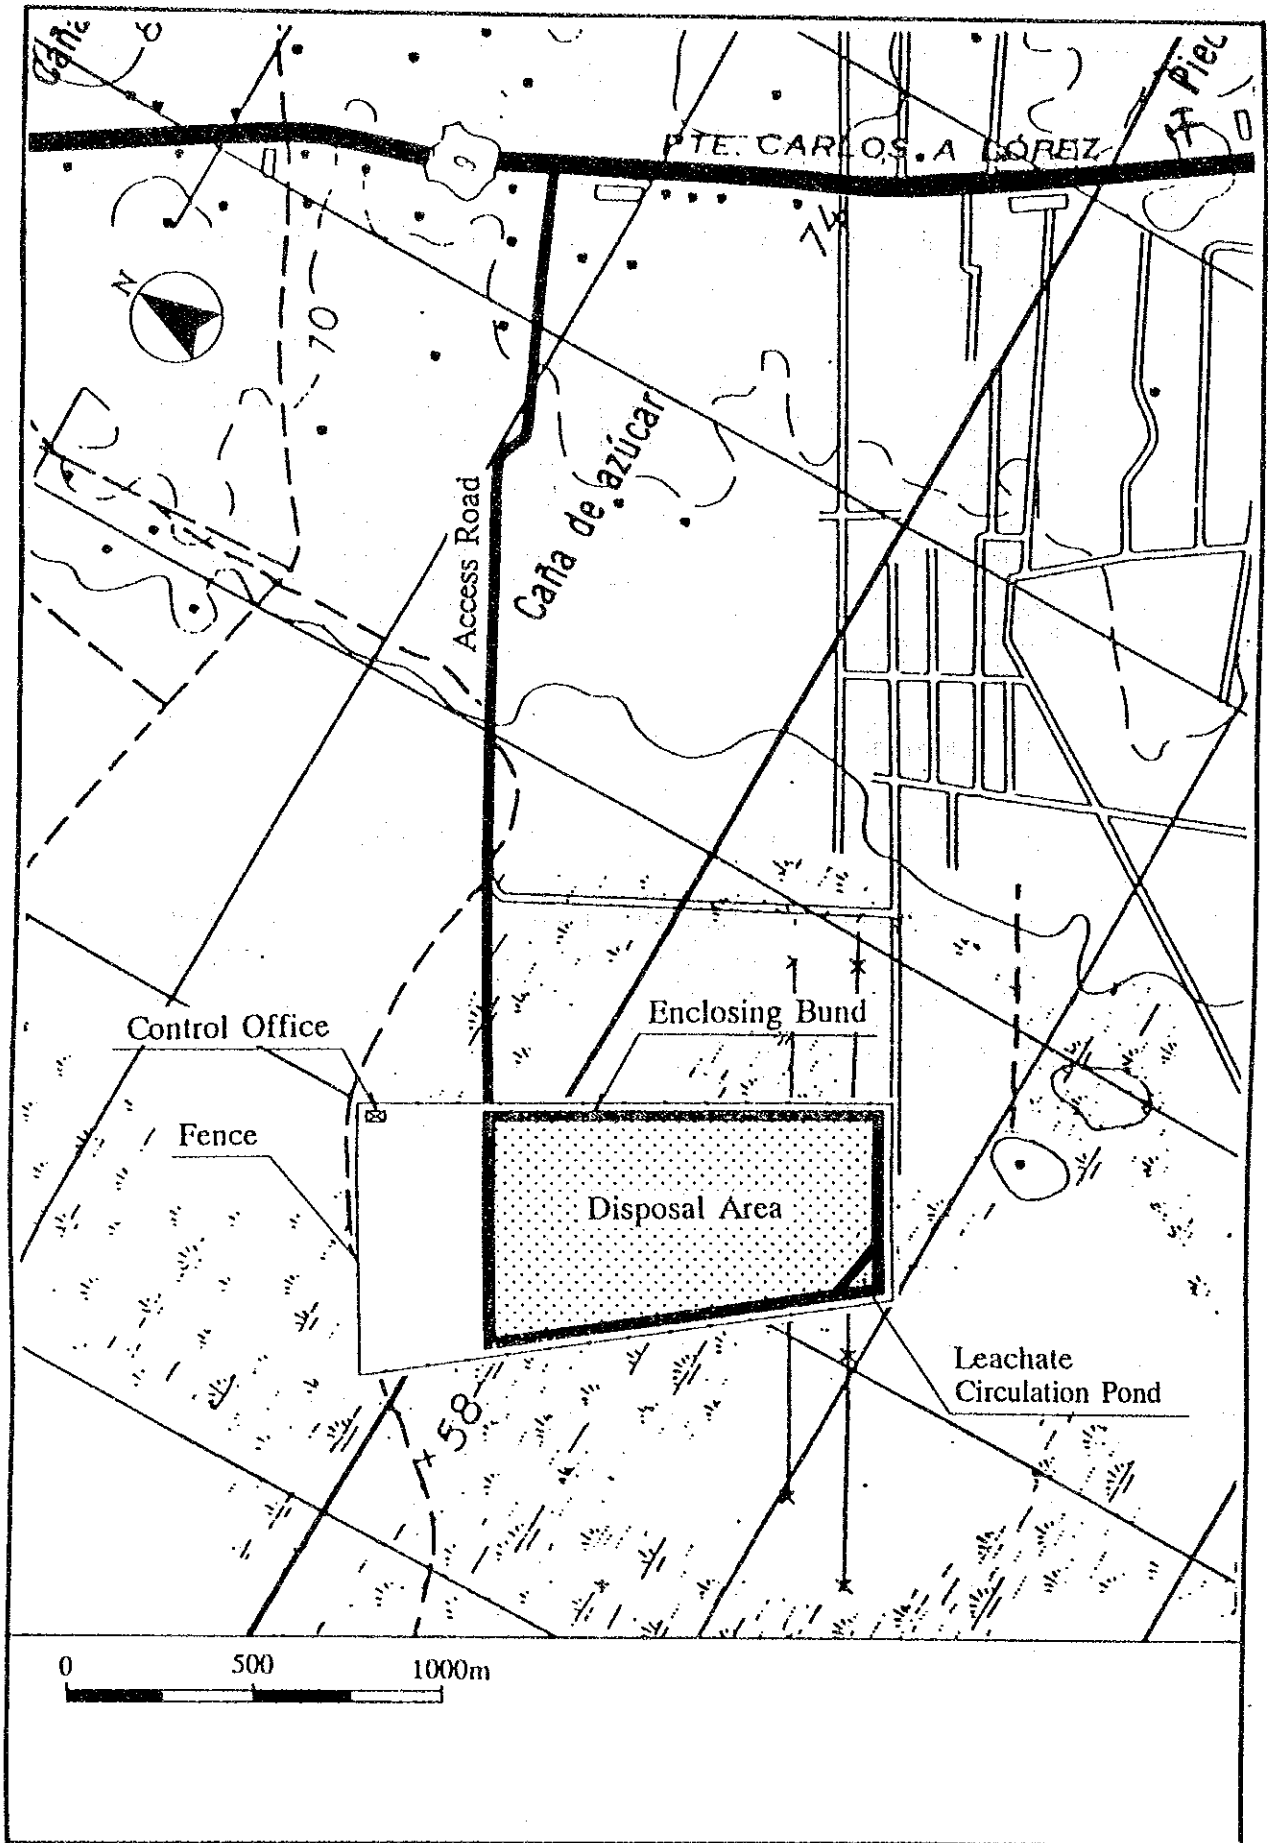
Arrangement of Sanitary Landfill in A-2 Site
